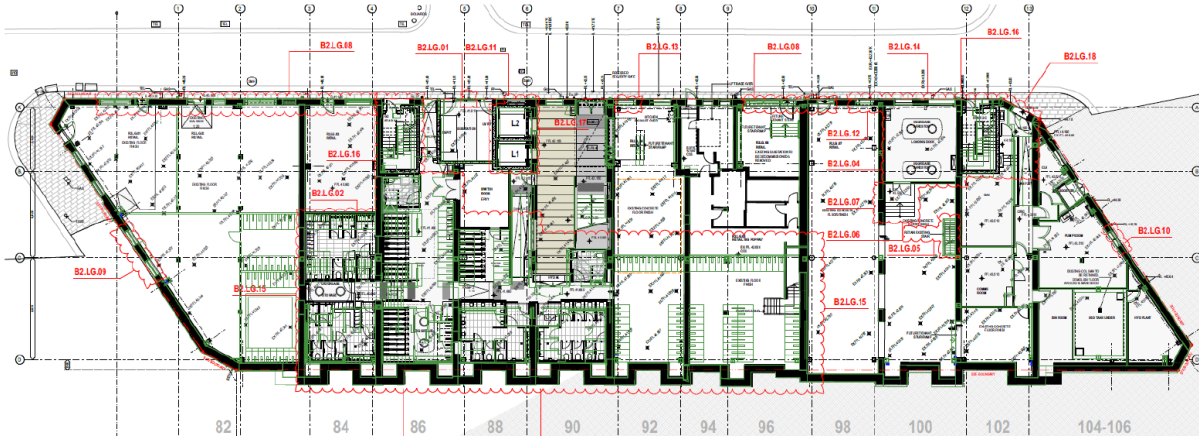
Comparison between the approved lower ground floor level and the proposed lower ground level showing reconfigured End of Journey and bicycle parking, removal of loading dock door, removal of storage area, window modifications and new lift core location
